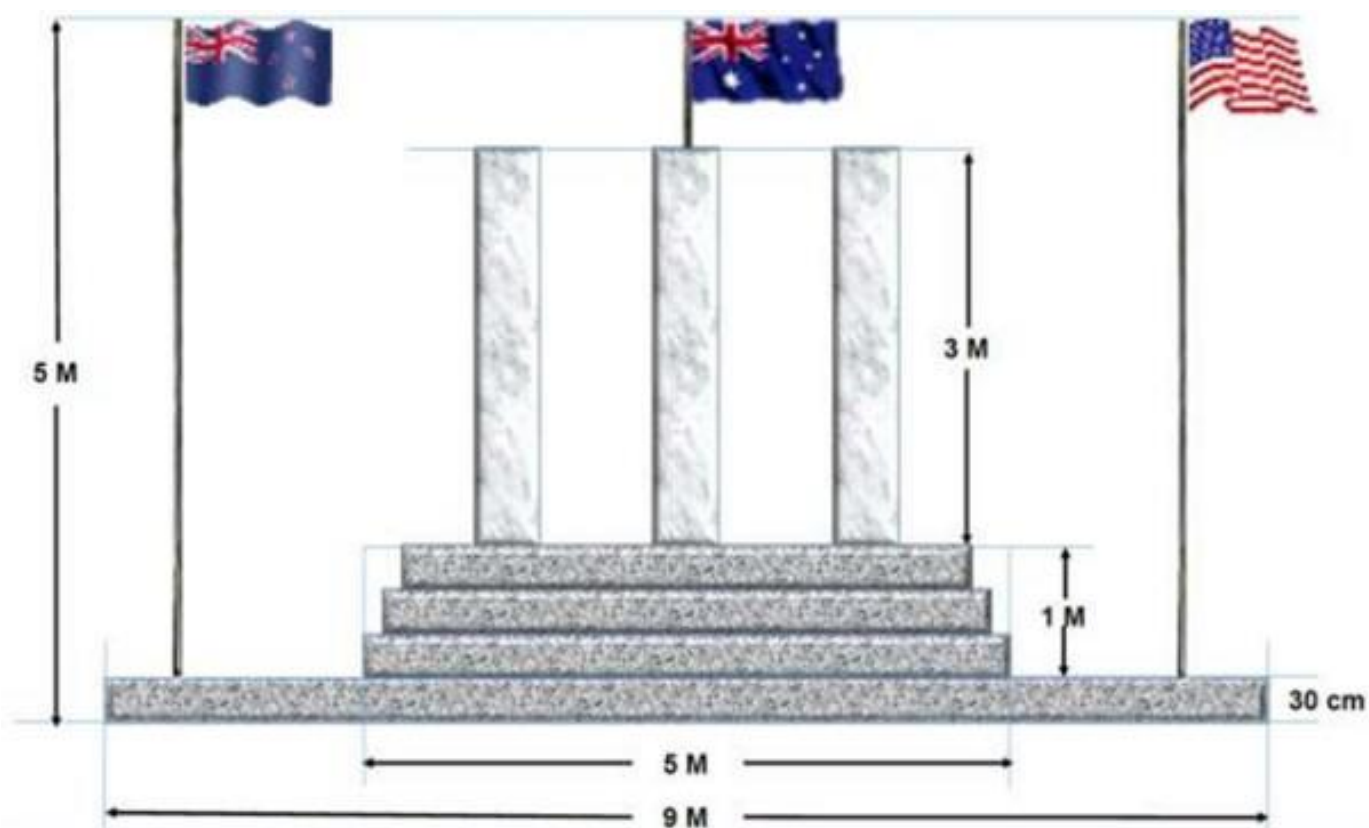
Design and Dimensions elevation plan for the proposed memorial
